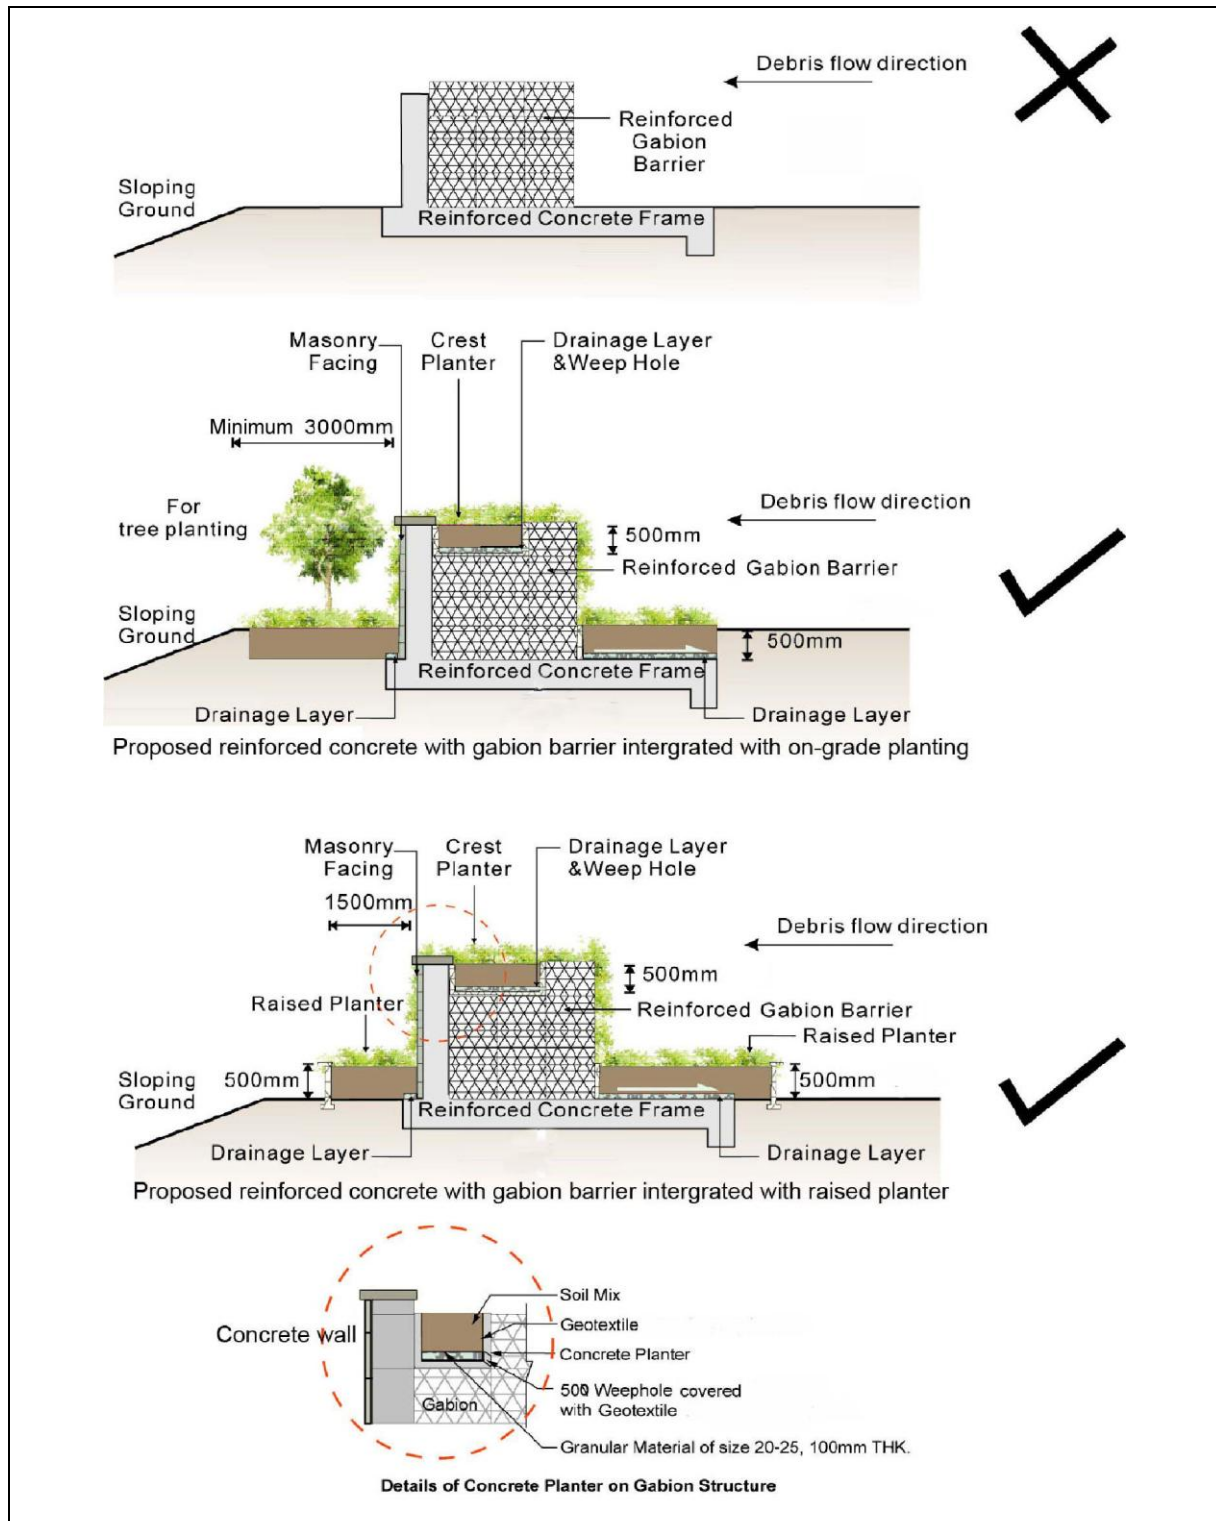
Reinforced Gabion Barrier with Reinforced Concrete Frame
